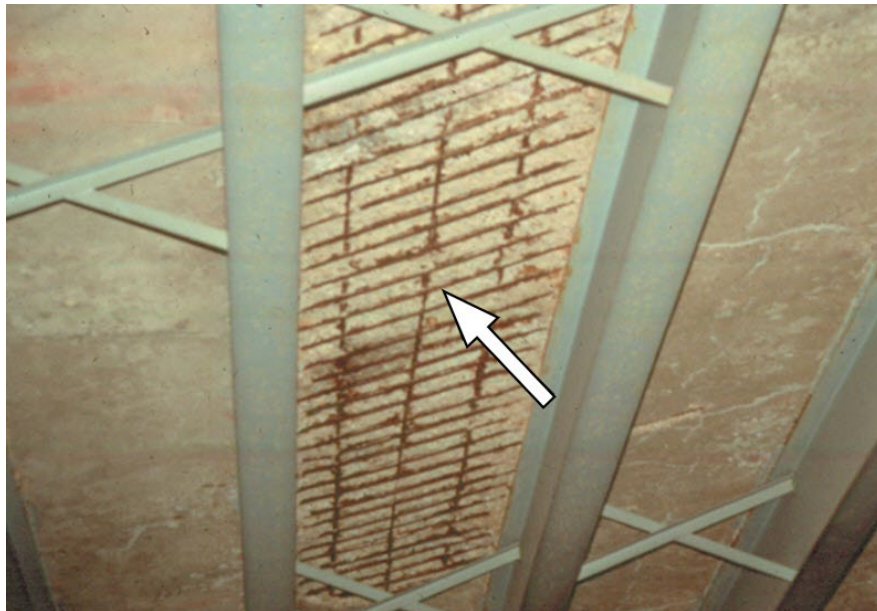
Spalling Showing Primary Deck Reinforcing Steel Perpendicular to Traffic
